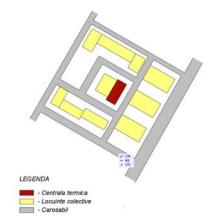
Example of central heating plant location in the quadrant of collective dwellings
